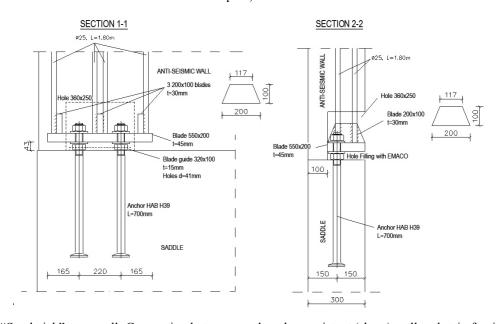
"Sandwich"-type wall: Connection between earthquake –resistant (shear) wall and strip footing (sections, see Figure 17)
